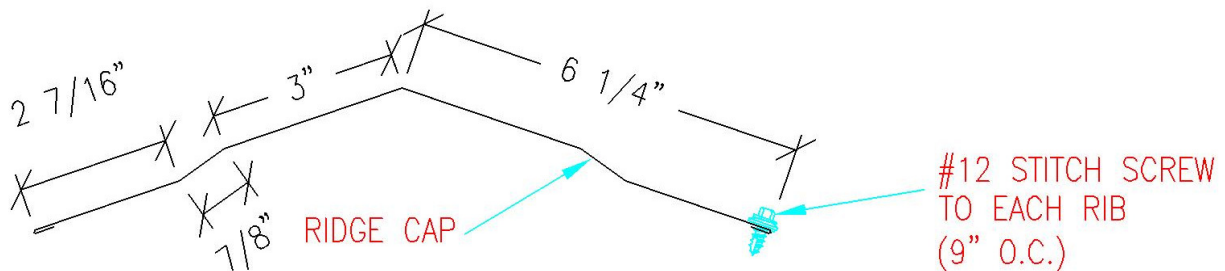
Ridge Cap – Central States, McElroy, & Union Corrugating
